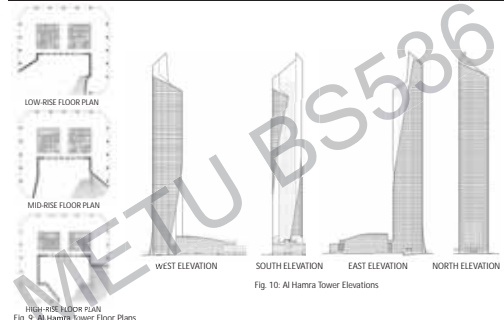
Al Hamra Tower Floor Plans: Asci, W., and M. Sarkisian. *The Al Hamra Fibrous Tower*.
